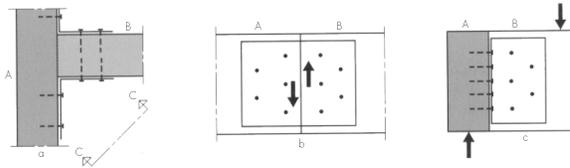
Beam to beam connection. Connection with two angle brackets and nails or screws.
